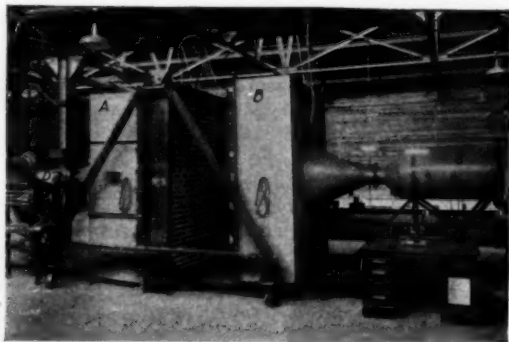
MACHINE OPEN WITH A BRICK WALL IN PLACE
